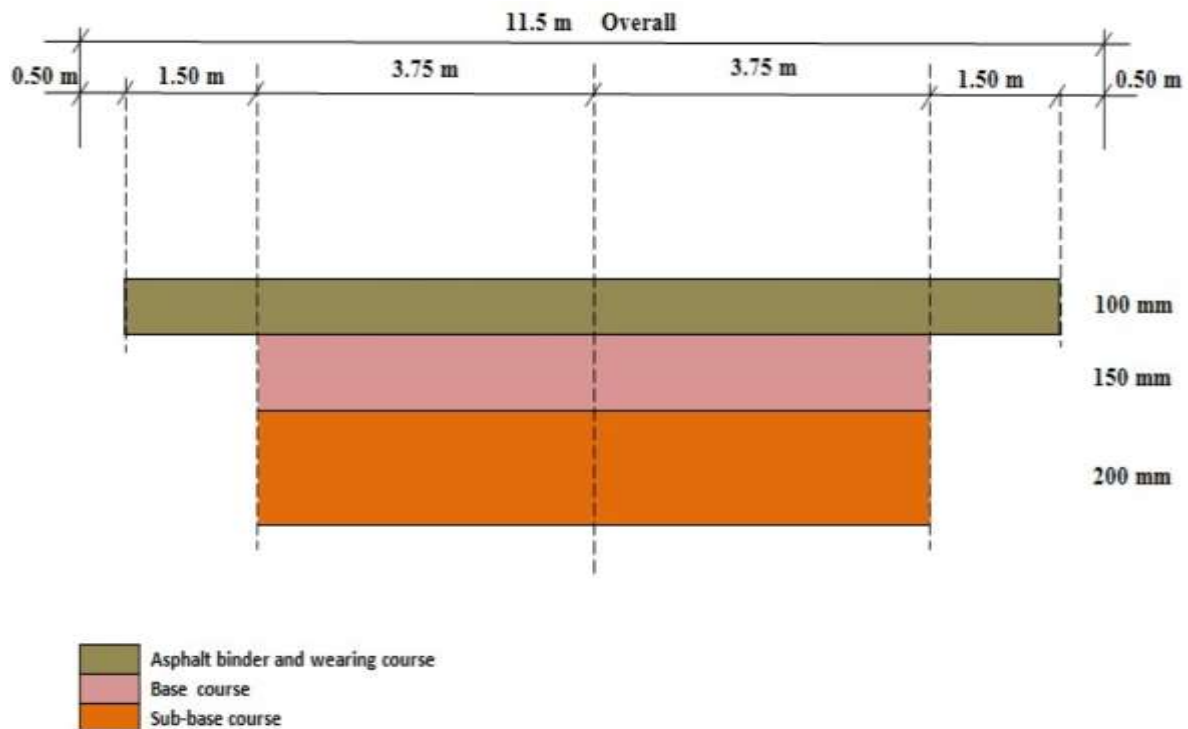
Typical pavement construction layers in Libya (Hunt, 1979) [43].
